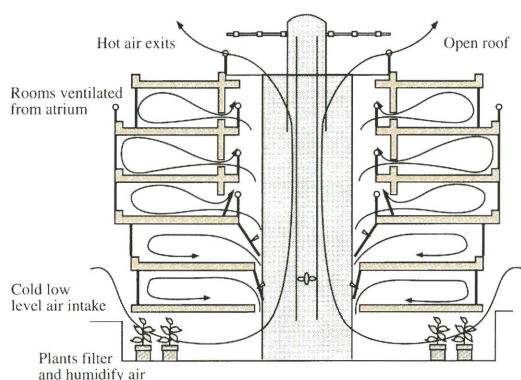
Summer ventilation. Longitudinal schematic.
